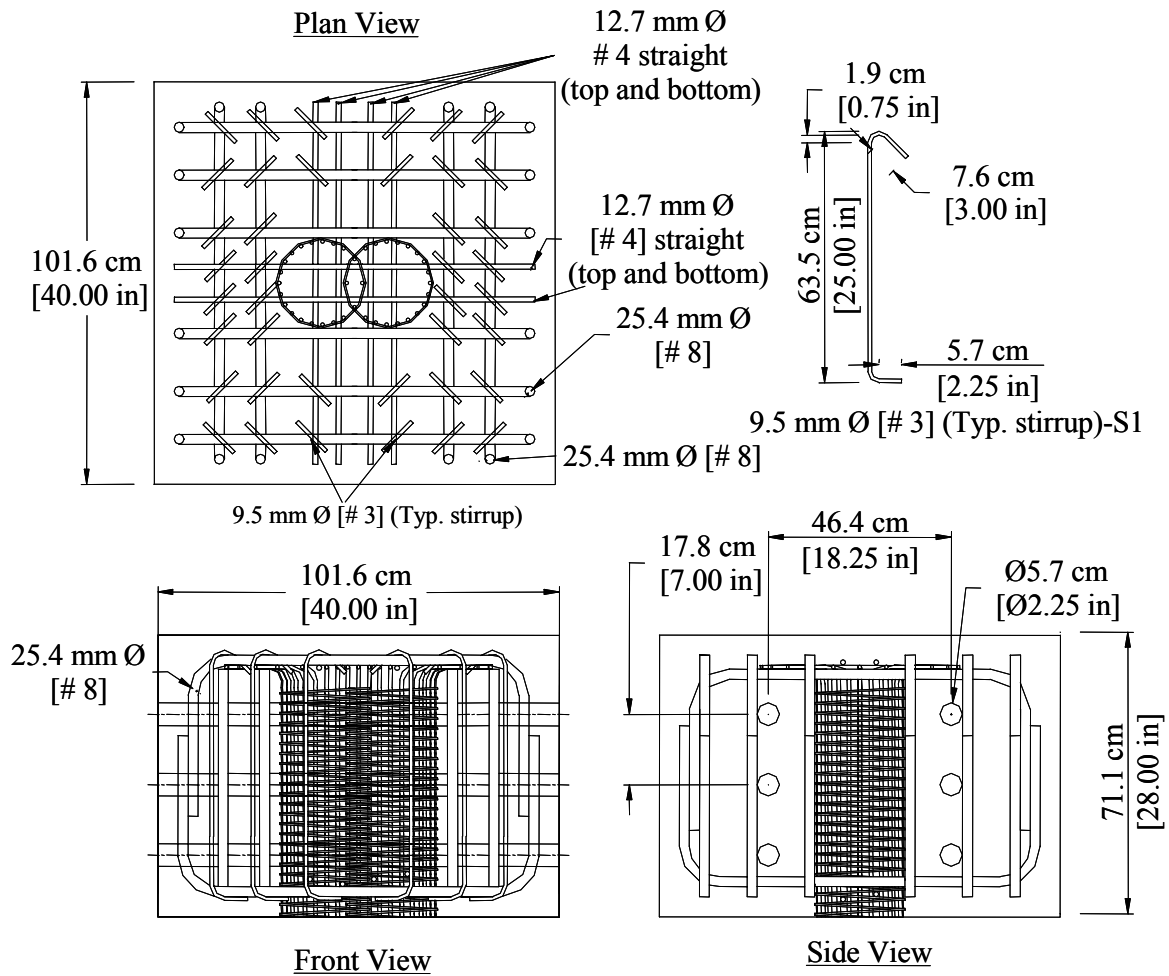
Plan and Section View of the Top Specimen Head with High Shear
